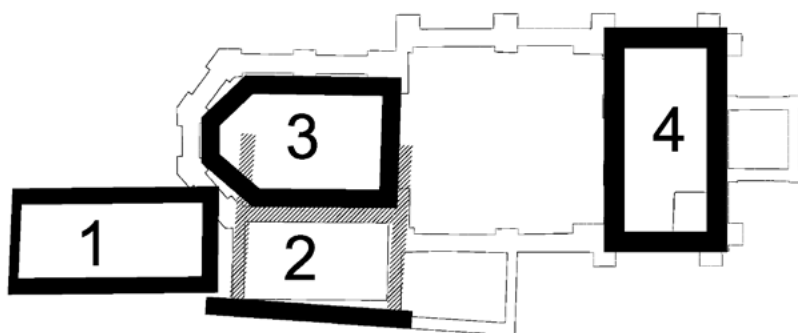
Wall discovered in the excavation of the northern sacristy wall
